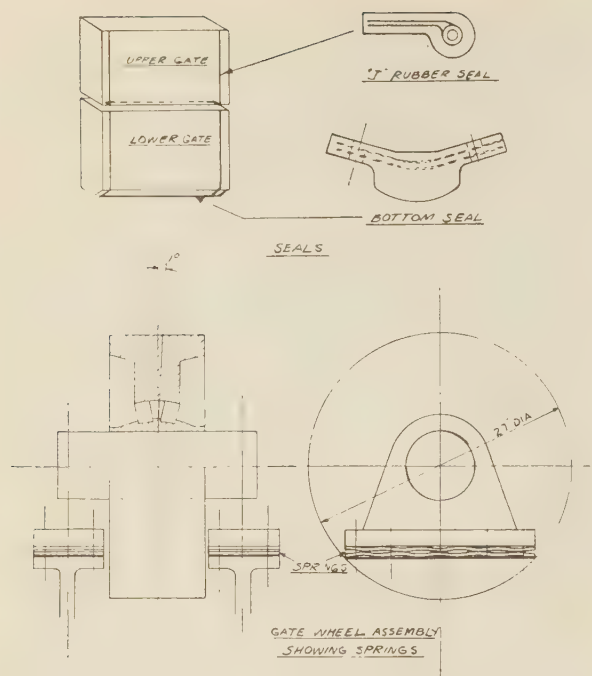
ARRANGEMENT AND SECTIONS OF RUBBER SEALS AT TOP; BELOW ARE MAIN WHEEL ASSEMBLIES AND CORRUGATED SPRINGS
